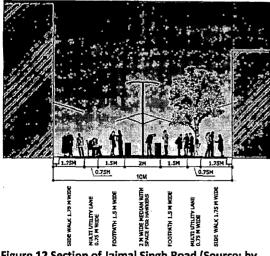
Section of Jaimal Singh Road (Source: by Author)
